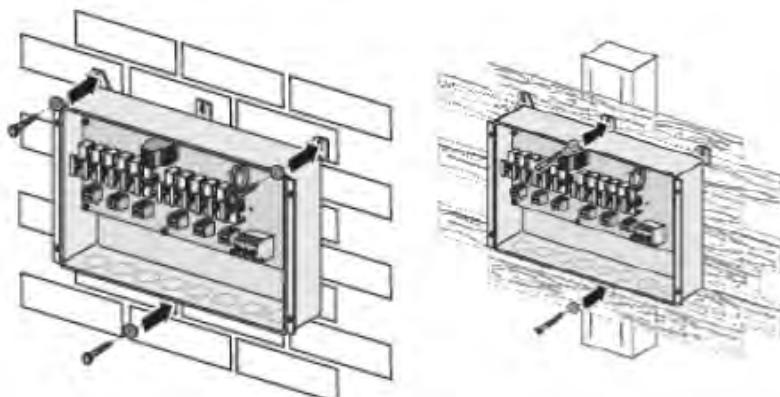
Wall & structure mounting of DC Combiner Box
